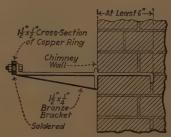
Anchor bracket for securing copper terminal ring to chimney wall.
